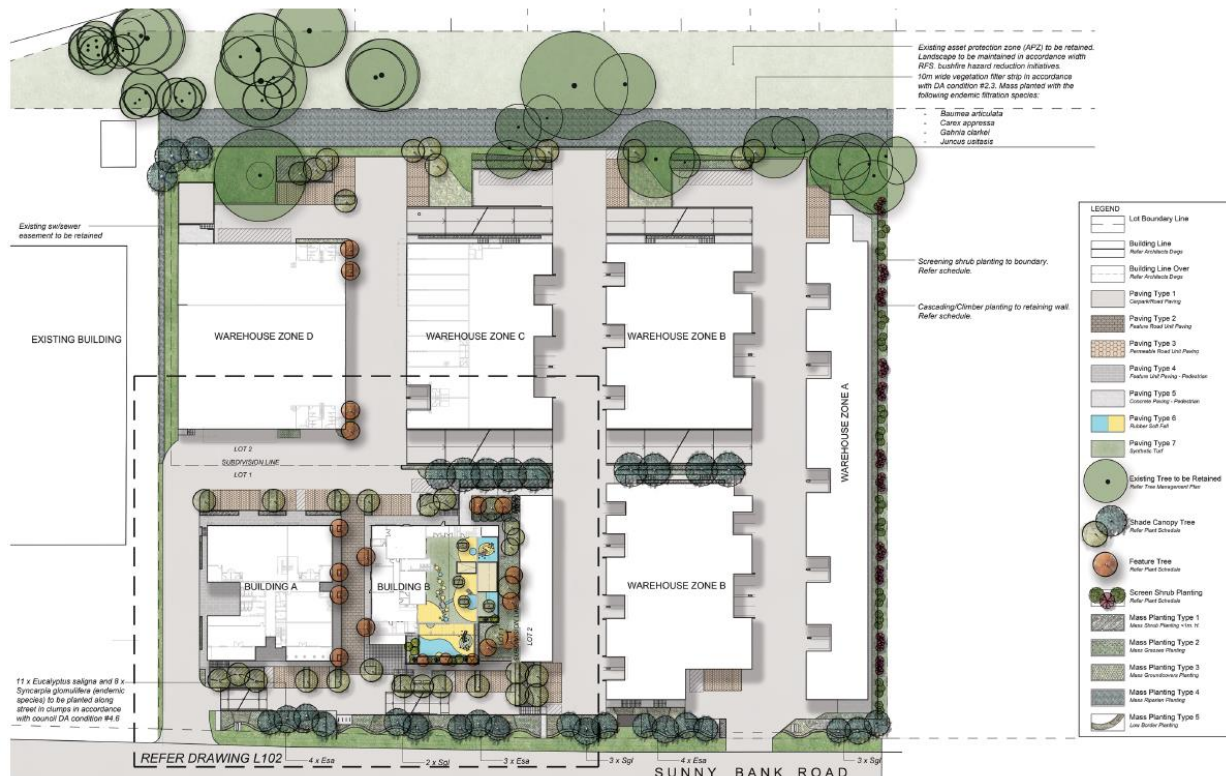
Extract of Landscape Masterplan (Source: Xeriscapes)
